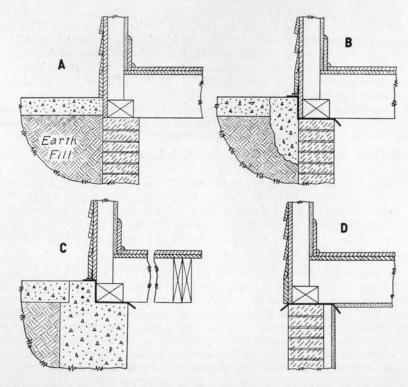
Earth-filled masonry porches and steps: A, affords easy entry to termites; B, a metal shield and a concrete barrier eliminate earth-to-wood contact; C, similar to B, used in new construction, cross bracing may replace solid header sometimes used at the sill; D, a metal shield used to protect woodwork above furred-out basement walls.
